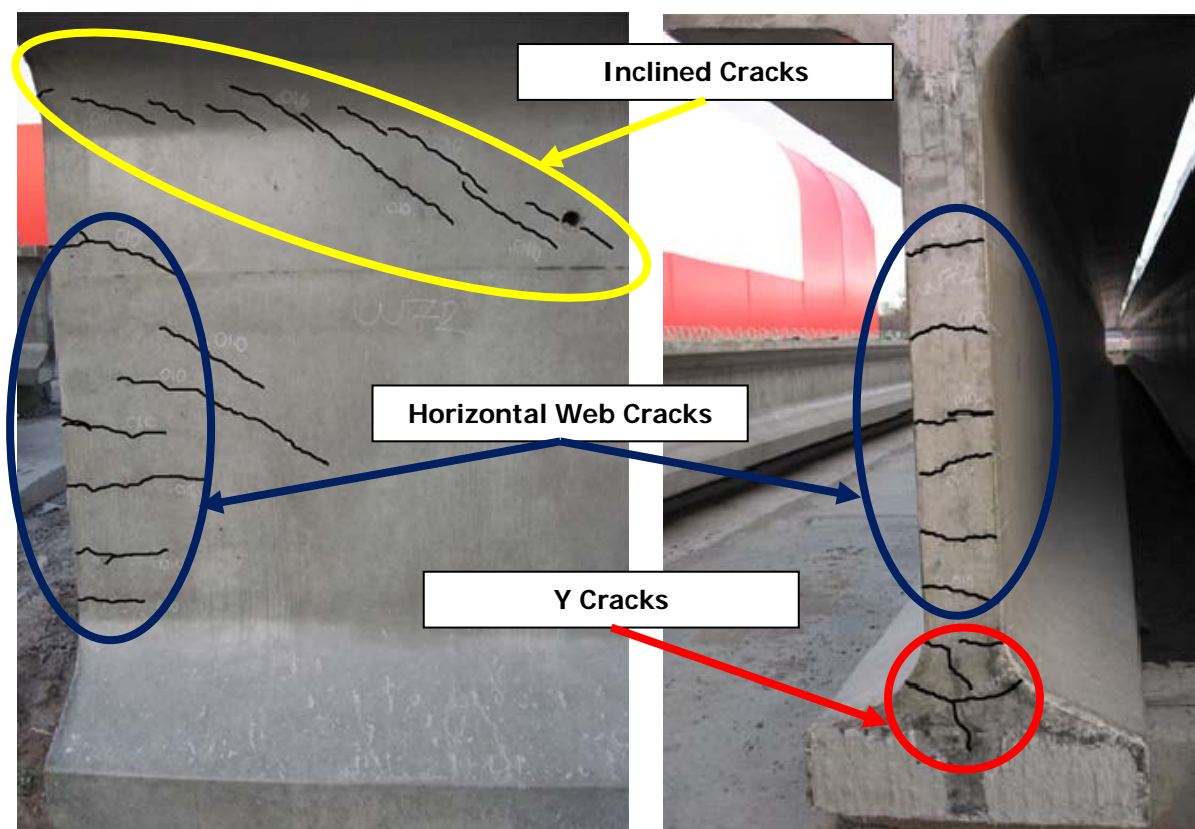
Typical inclined, web and Y cracks marked on a 72W girder.
